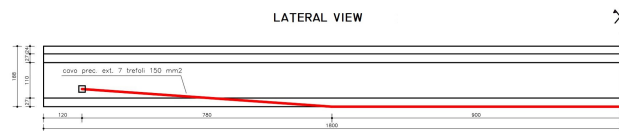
External prestressed cables layout profile (red solid line) adopted as a traditional intervention proposal .
